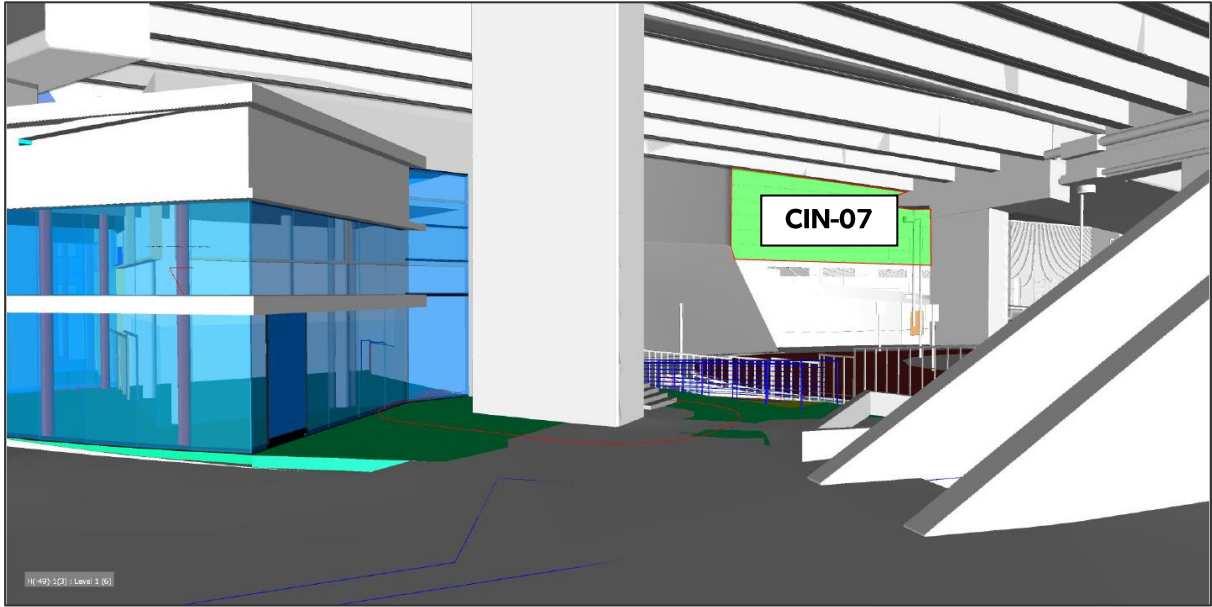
| South west view of signage zone CIN-07 from ground level (source: Applicant’s RtS)
